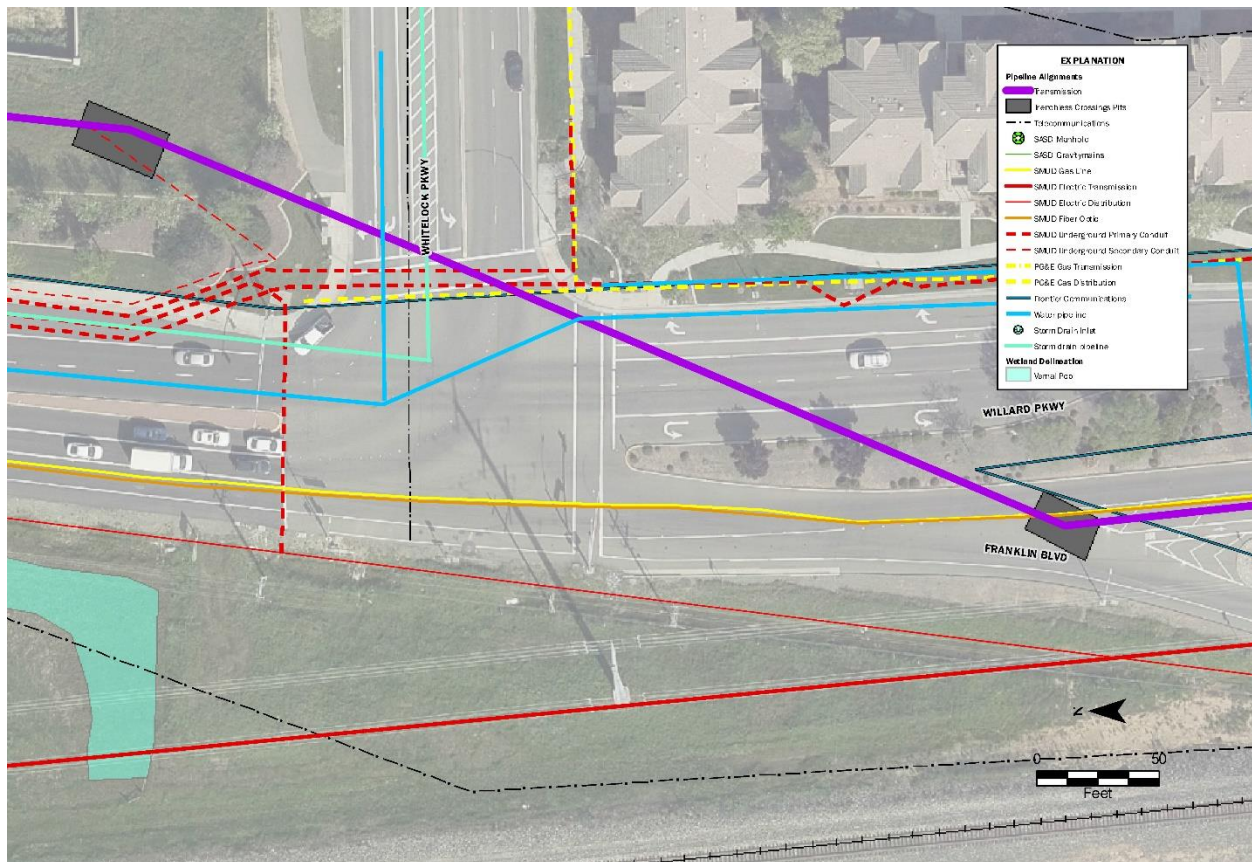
Proposed Trenchless Crossing of Whitelock Parkway at Franklin Boulevard
